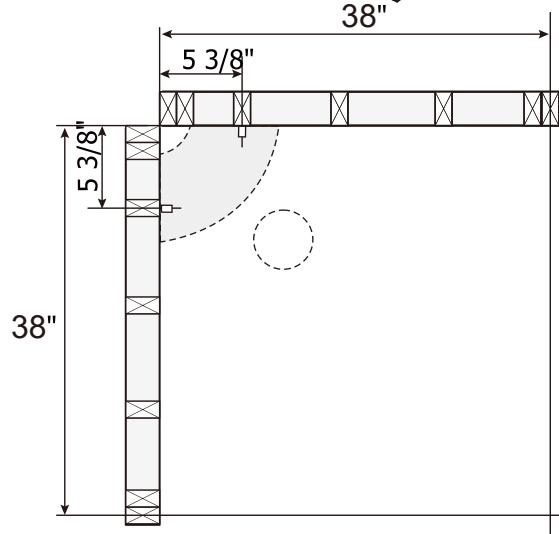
For a new construction and whenever possible in the case of a renovation, install an extra stud in each wall. Each stud has to be at a distance of 38" (965mm) from the wall's corner. Fig. 1
